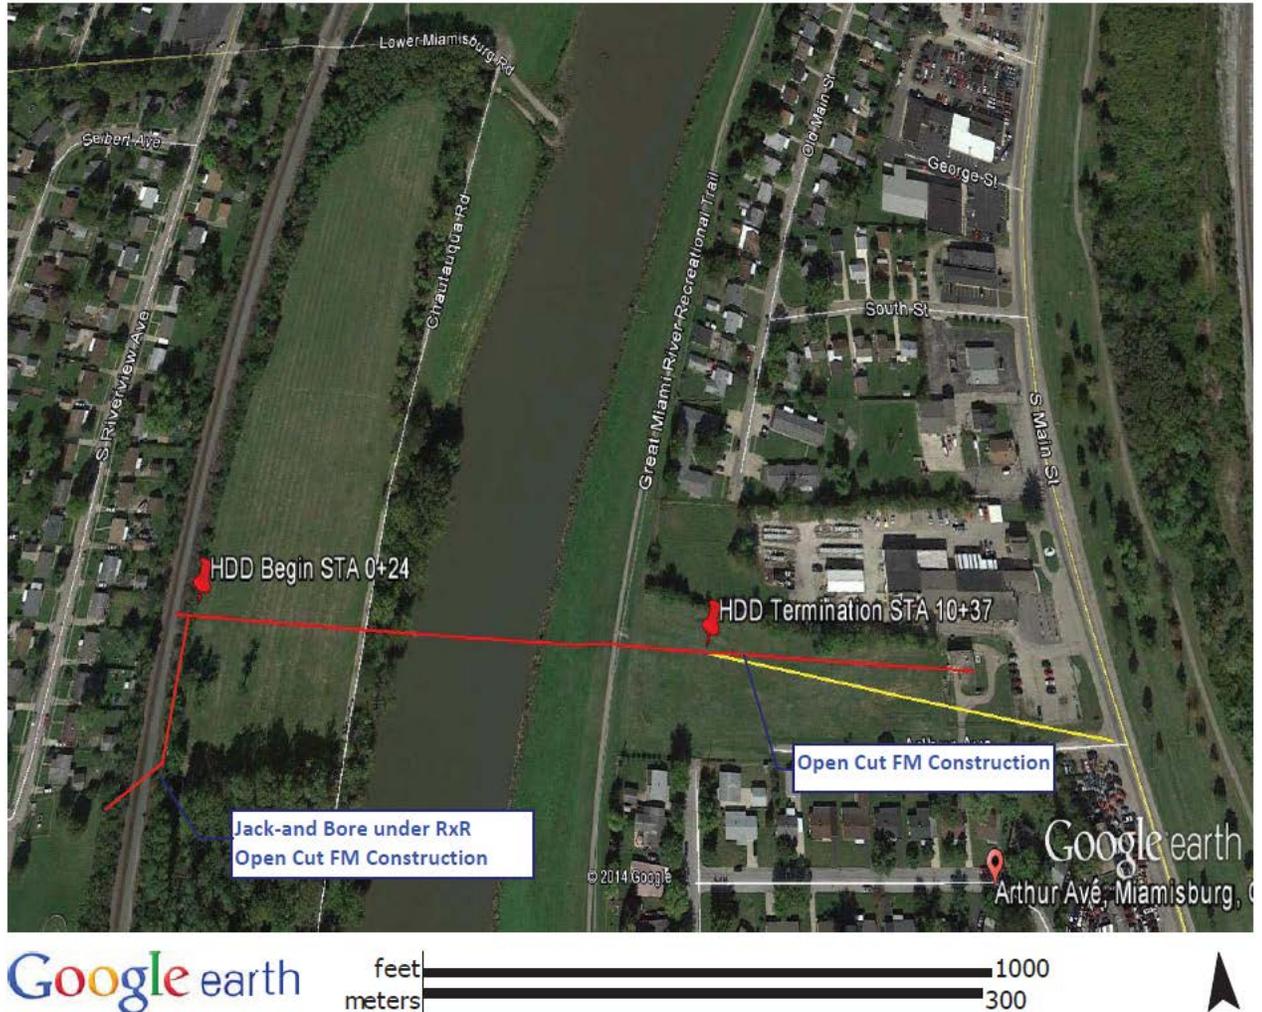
, Railroad and River Crossing Details (Source: Hazen and Sawyer)
